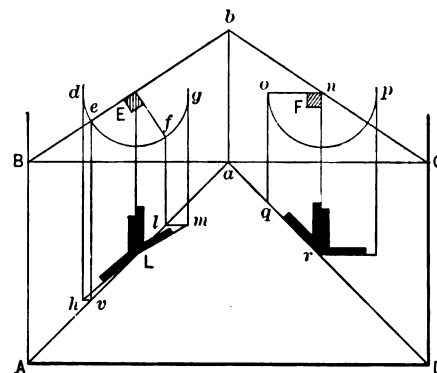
Another Method of Working Purlins when Face is Against the Rafter, and Also when One Corner Rests Against the Rafter.
